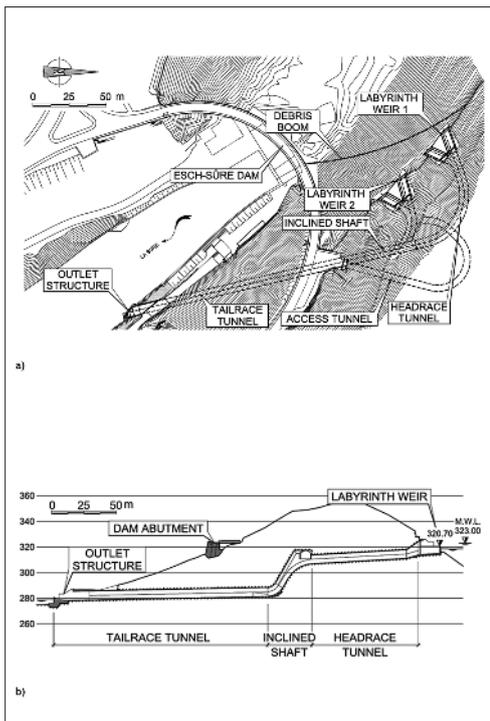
General layout and longitudinal section of the new spillway at the Esch-sur-Sûre Dam
